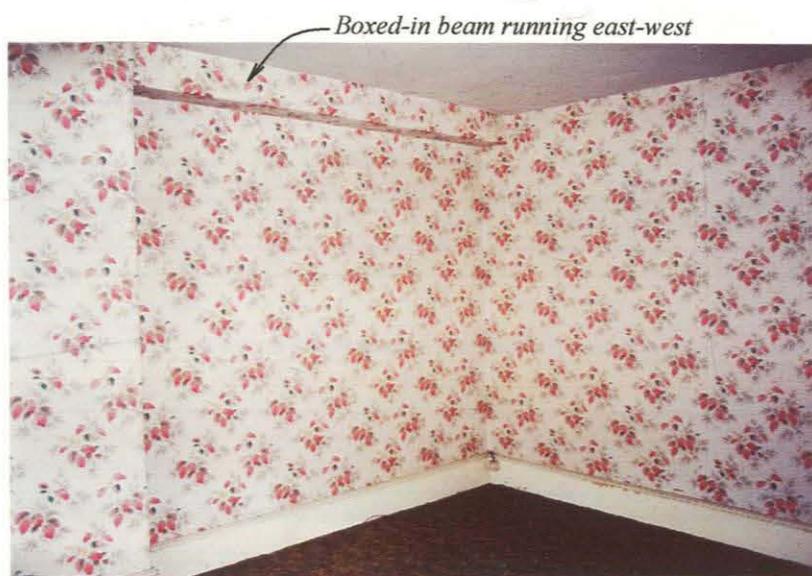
Room 65/18, no.65, first floor; southwest corner of room featuring a boxed-in beam aligned east-west, and the south wall return.
